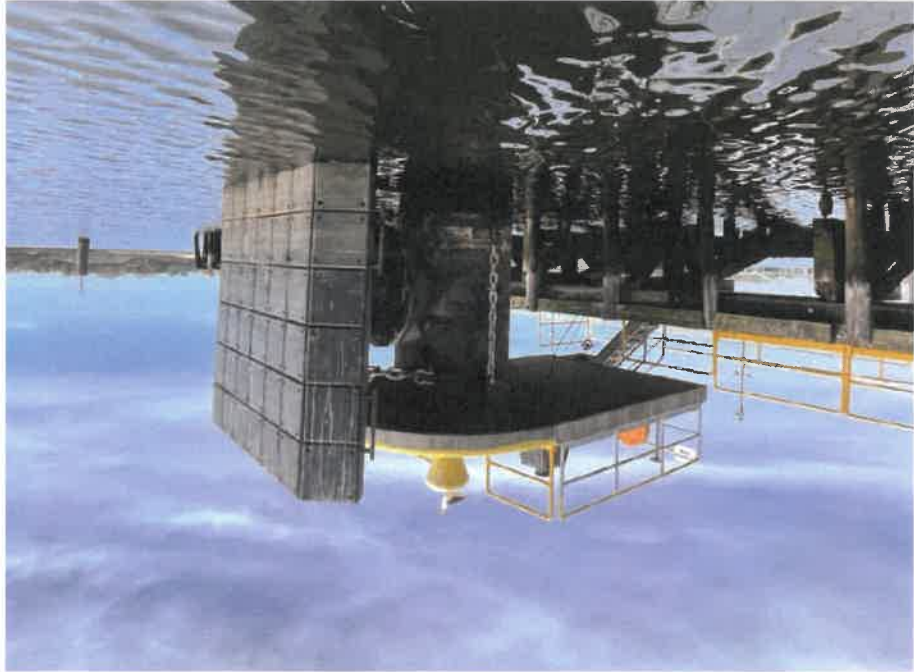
Steel monopile supported concrete mooring dolphin MDS.
